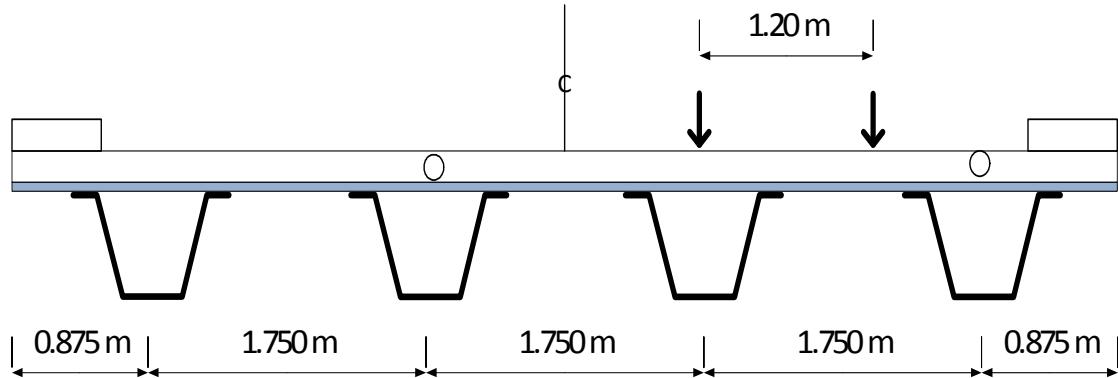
Arrangement of loads and hinges to calculate load distribution factor for internal girders
